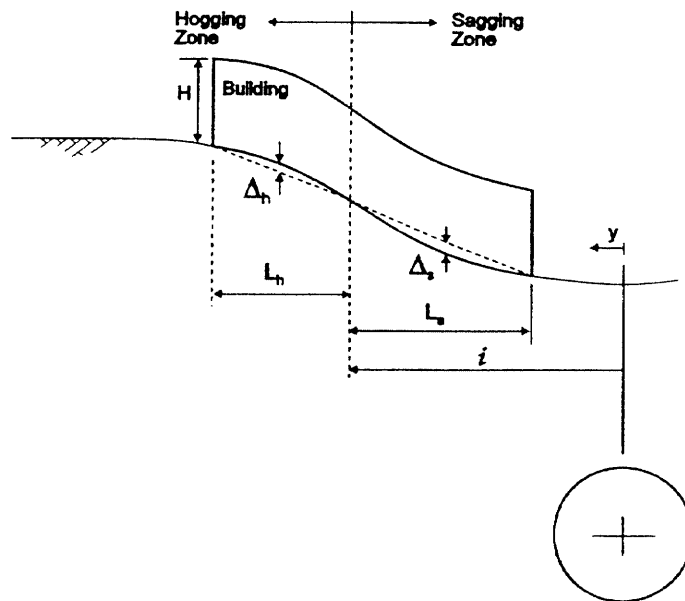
Sagging and Hogging of Building Deformation due to Tunneling (Mair et al. 1996)
